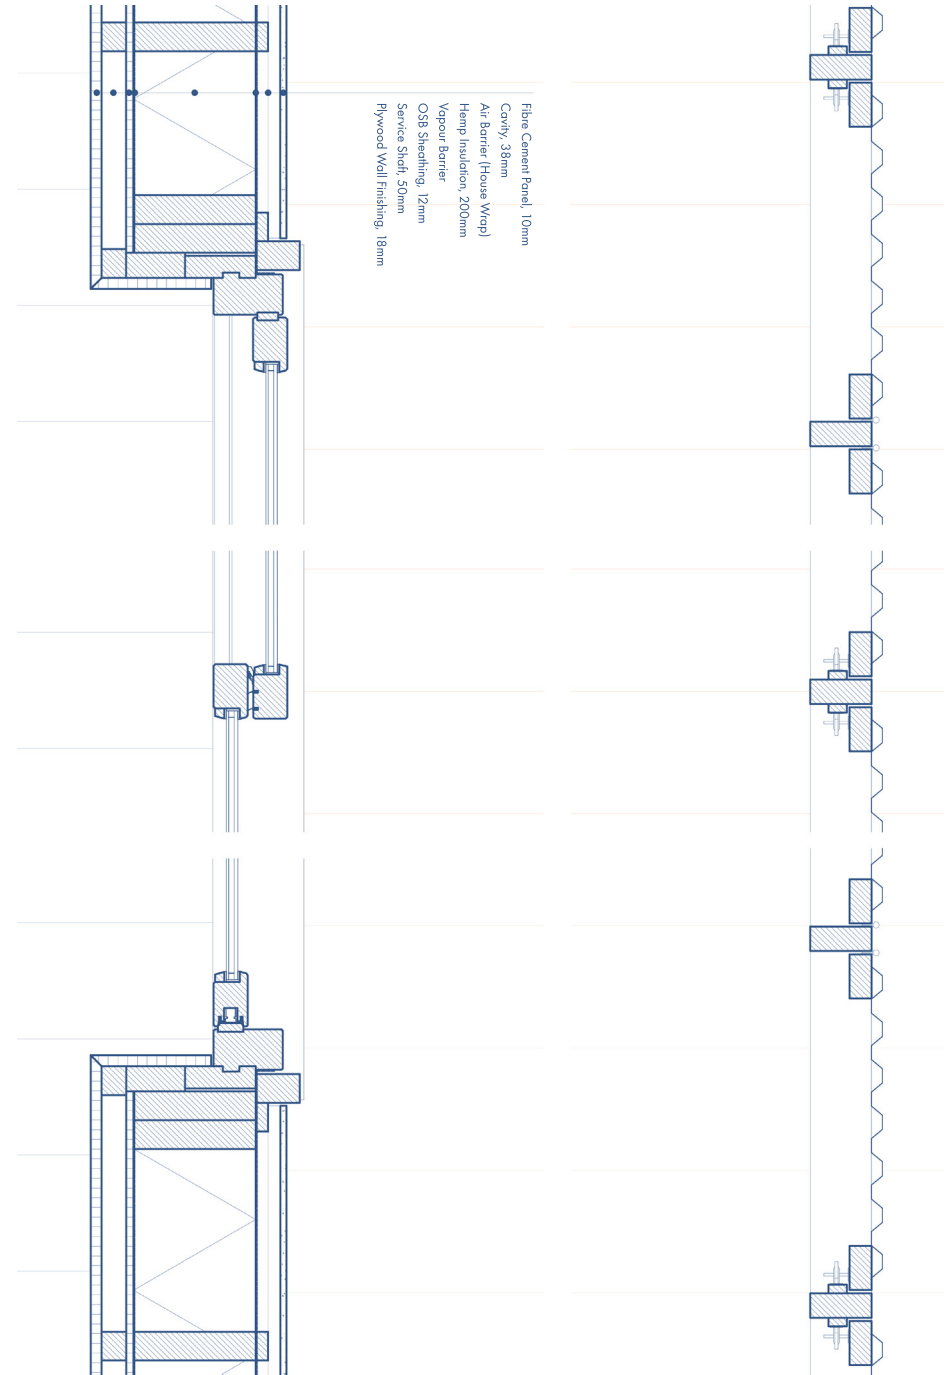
1:5 Plan of the Sliding Door and Greenhouse
